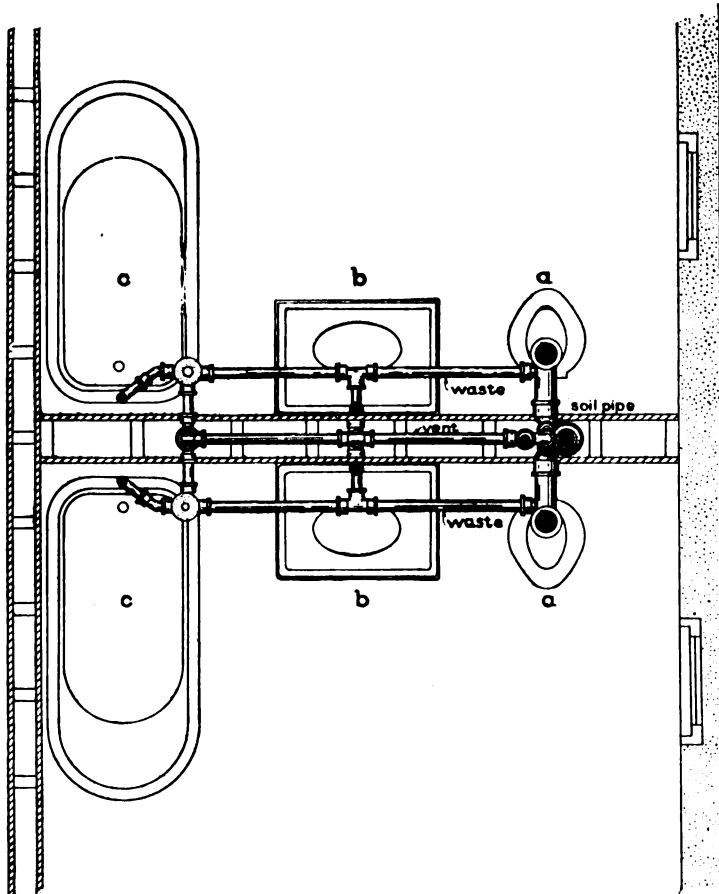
Plan of Complete Installation Shown in Part in Fig. 167.
